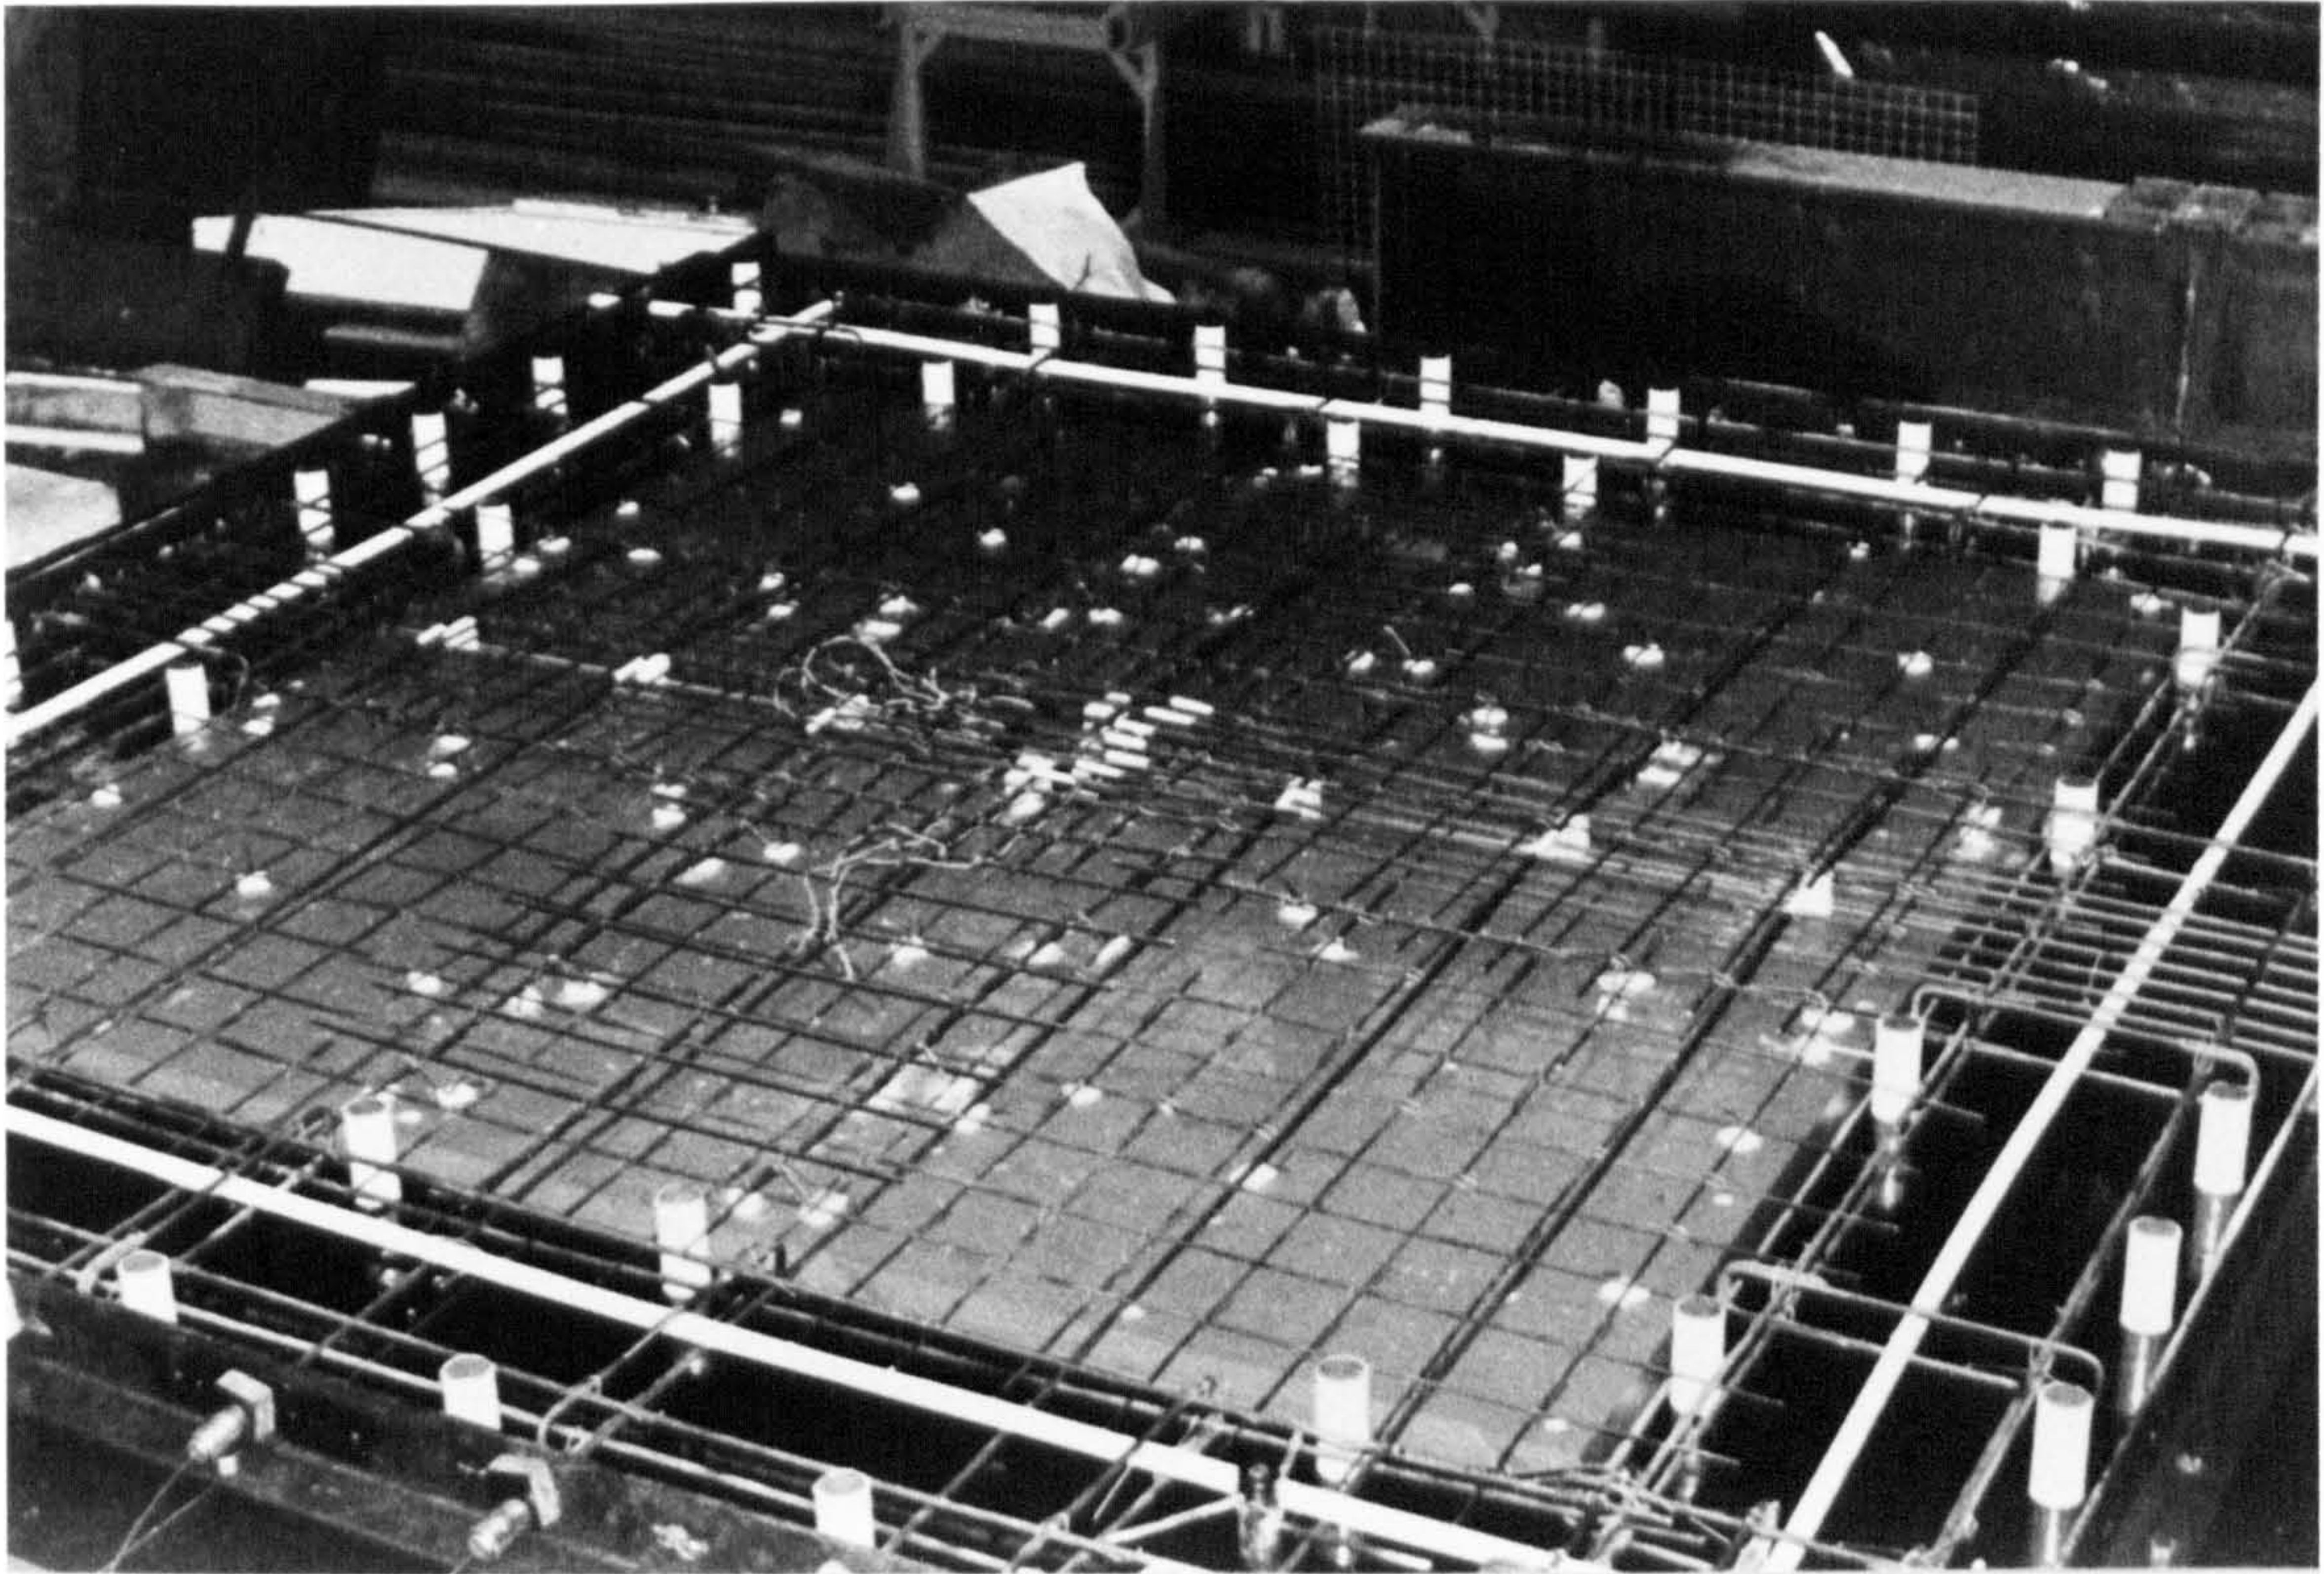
Bottom non-prestressed reinforcement (B1 to C1)
